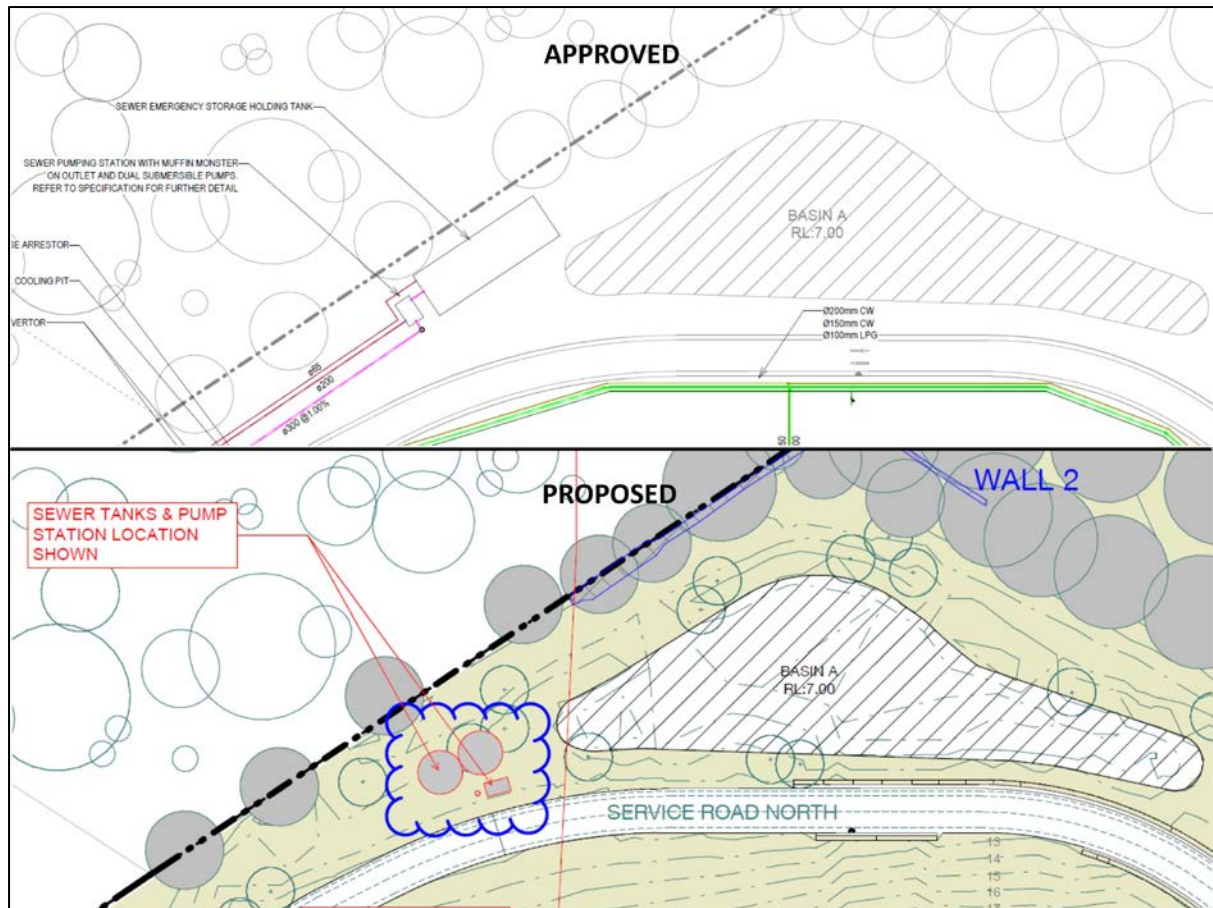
| Approved and proposed SPS with additional tank (Base source: SSD-10353 Approved Plans and SSD-10353-Mod-1 Modification Report)
